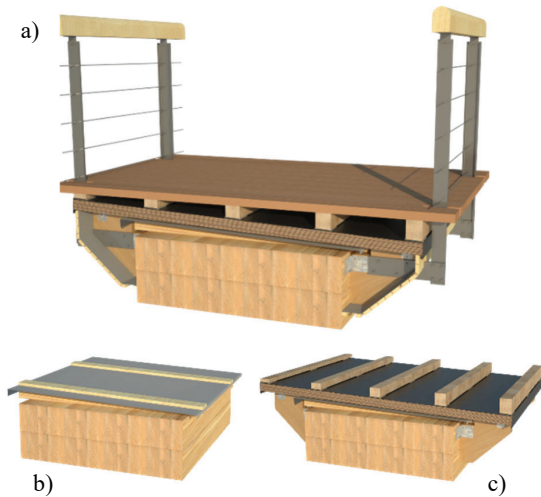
build-up of STMB a) total cross-section, b) lower water shielding, c) upper water shielding
